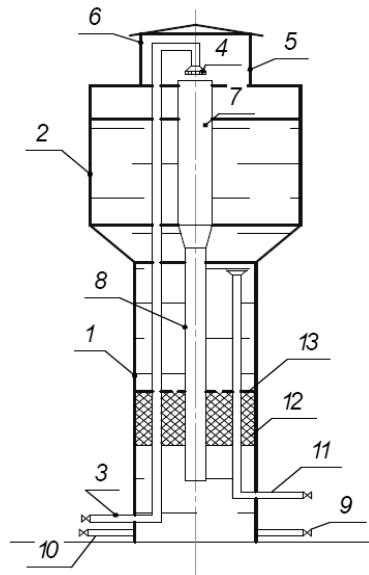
Structural scheme of the tower-column with a polystyrene filter:
